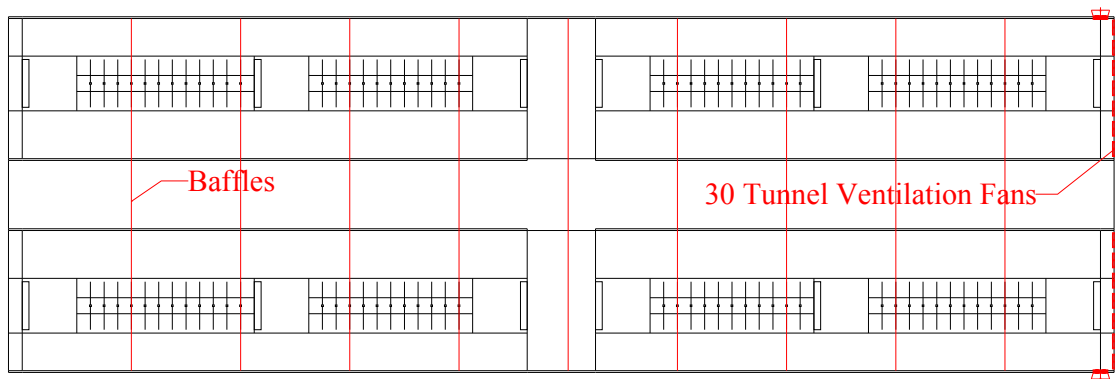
200 stall 4 row freestall shelter with 30 Tunnel Ventilation fans.
